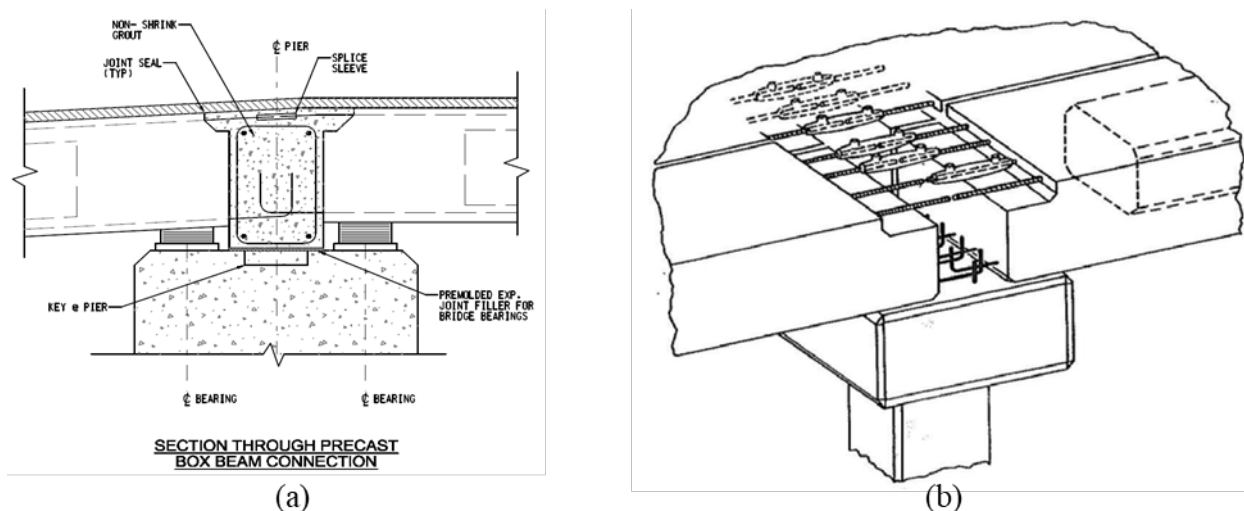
Example continuity connection at pier for precast box beam without CIP deck from Unquowa Road (CT) [104]
